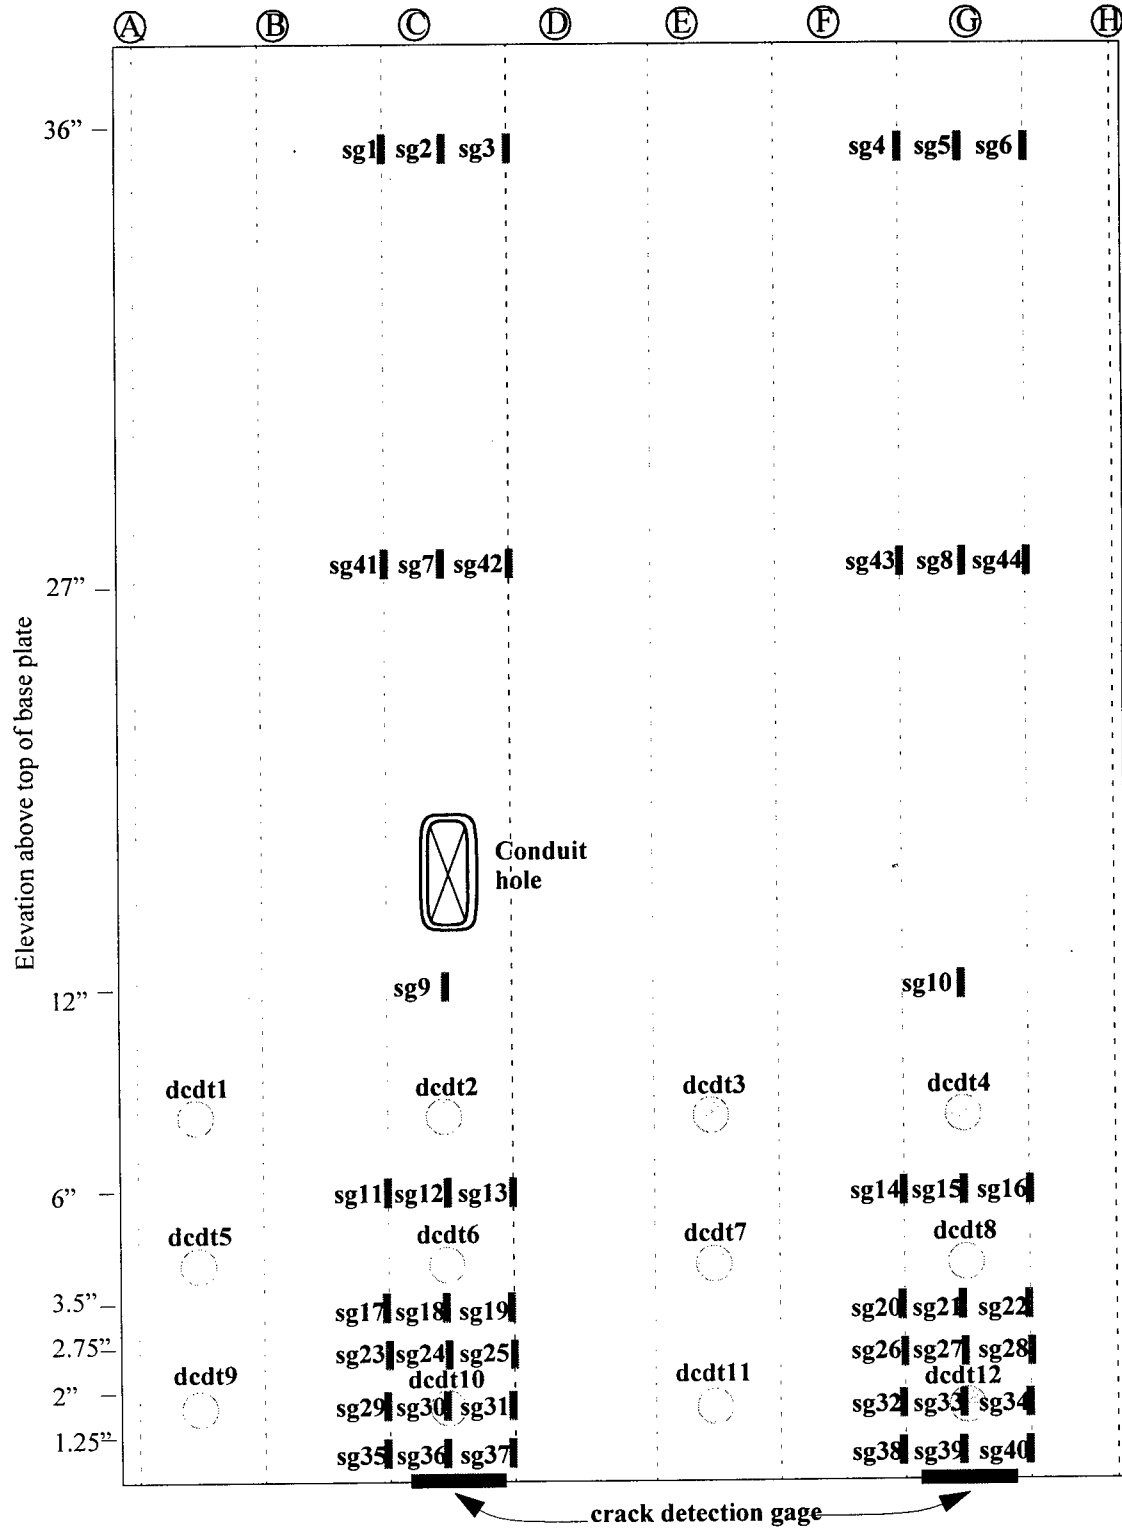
Exploded view of the instrumentation for Specimen AB1
